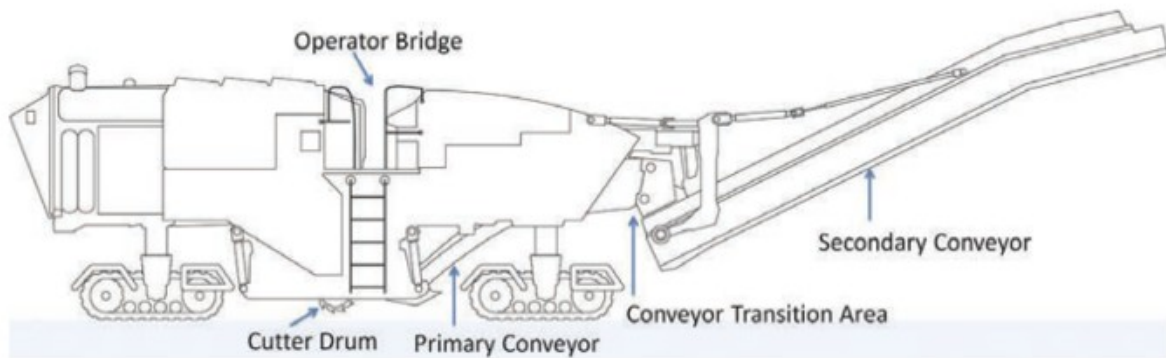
Schematic of a Typical Milling Machine (NIOSH, 2015)
